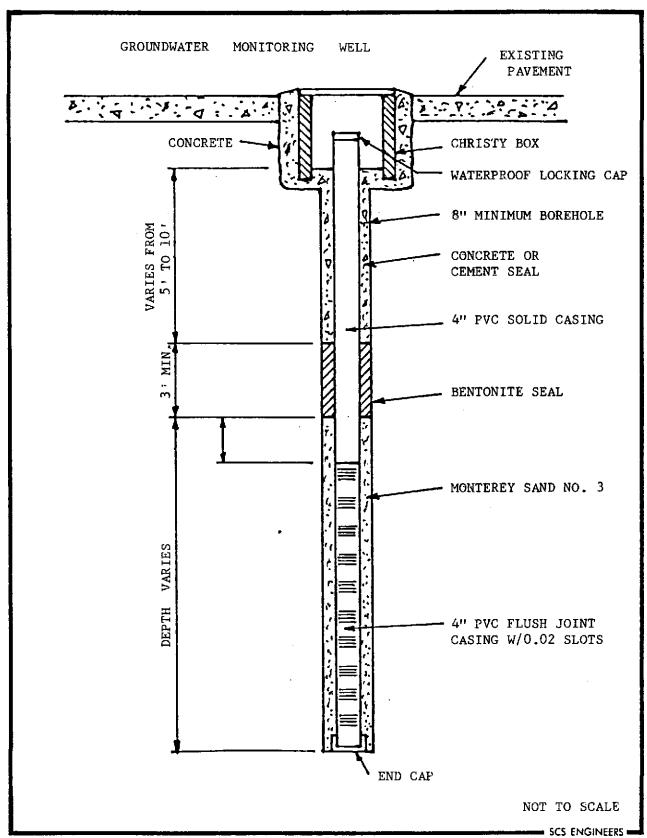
Typical Well Construction Details for the Installation of Groundwater Monitoring Wells
